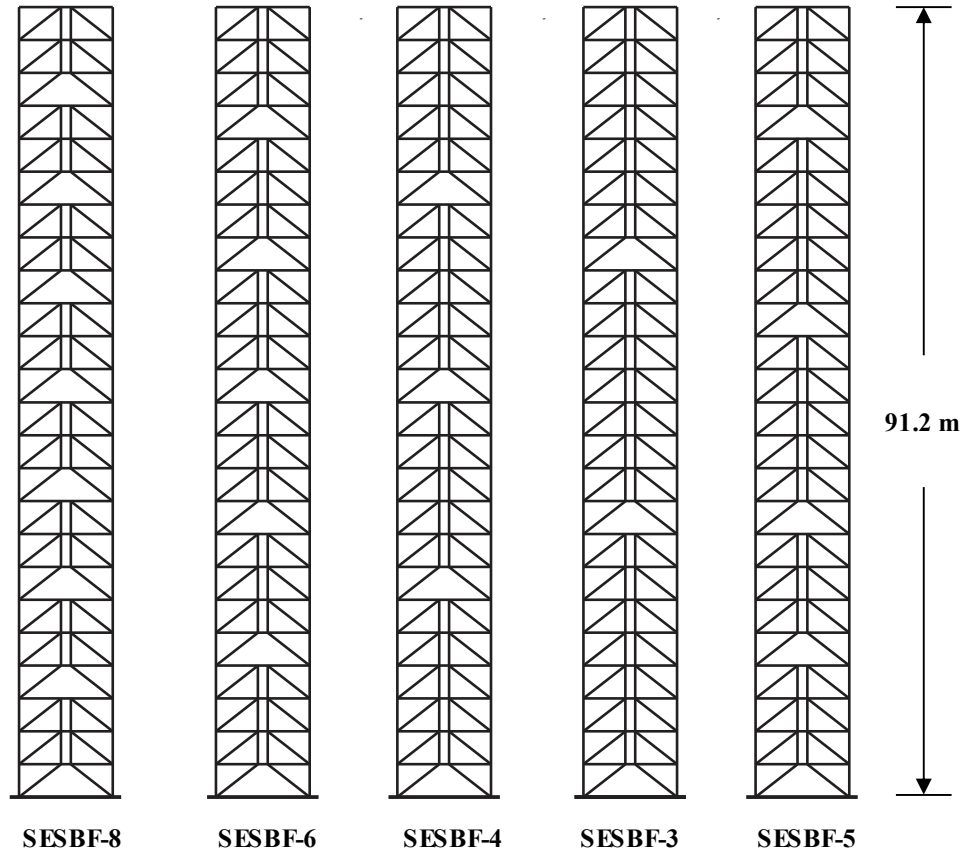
The studied SESBF- n configurations of the 24-storey building
